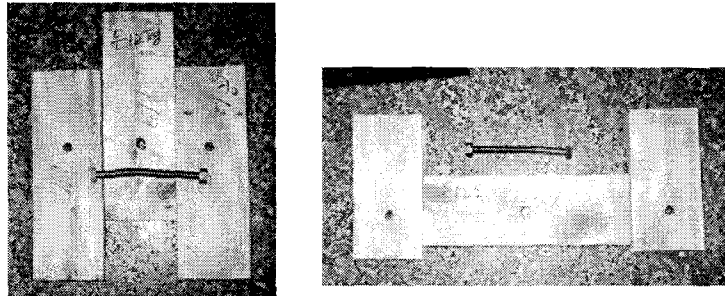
Failure modes for double shear bolted connections with hardwoods and 12.4mm bolts
